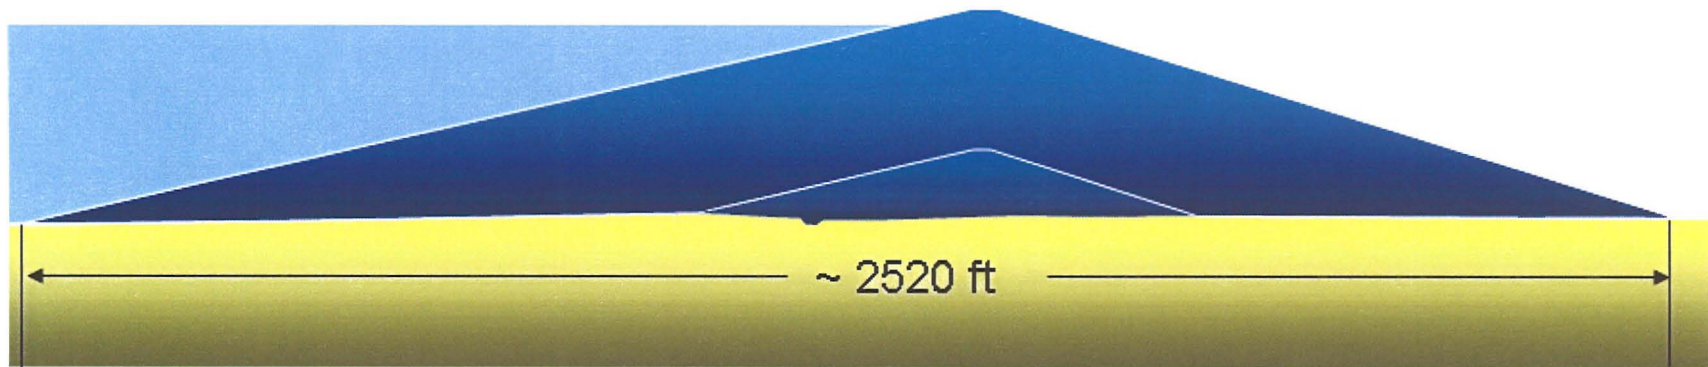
Dam Cross Section – Reservoir at Elev. 1752 ft.
